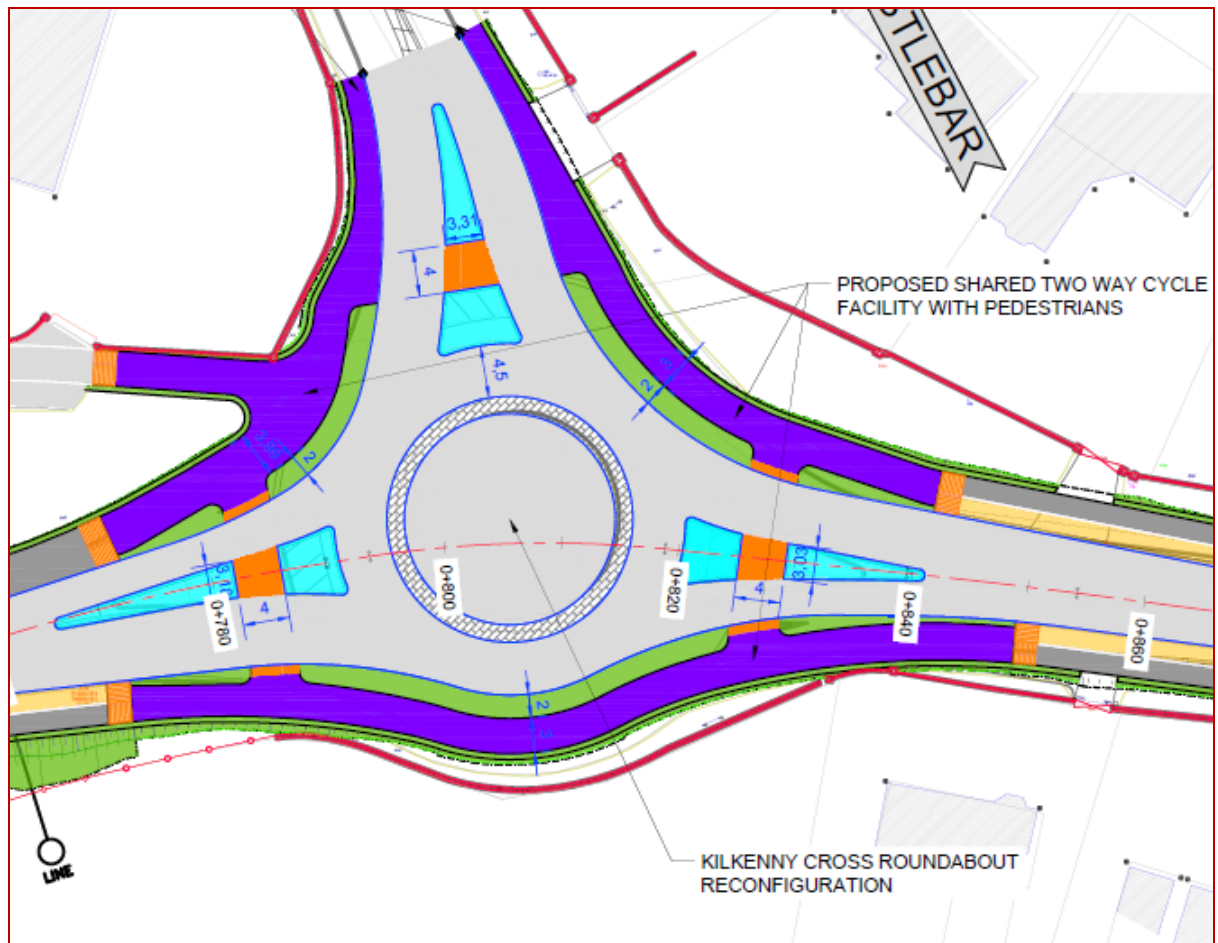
Kilkenny Cross Roundabout – Reconfigured Layout with New Pedestrian & Cyclist Facilities
